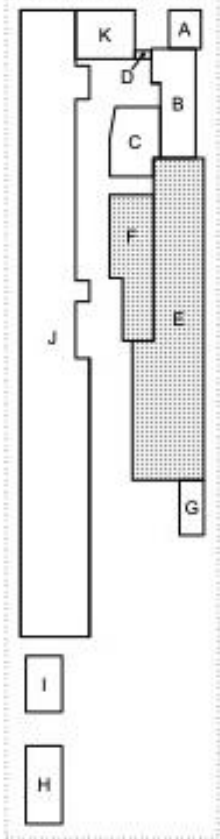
Floor Plans, Foundry, Forge Cupola, and Forge
